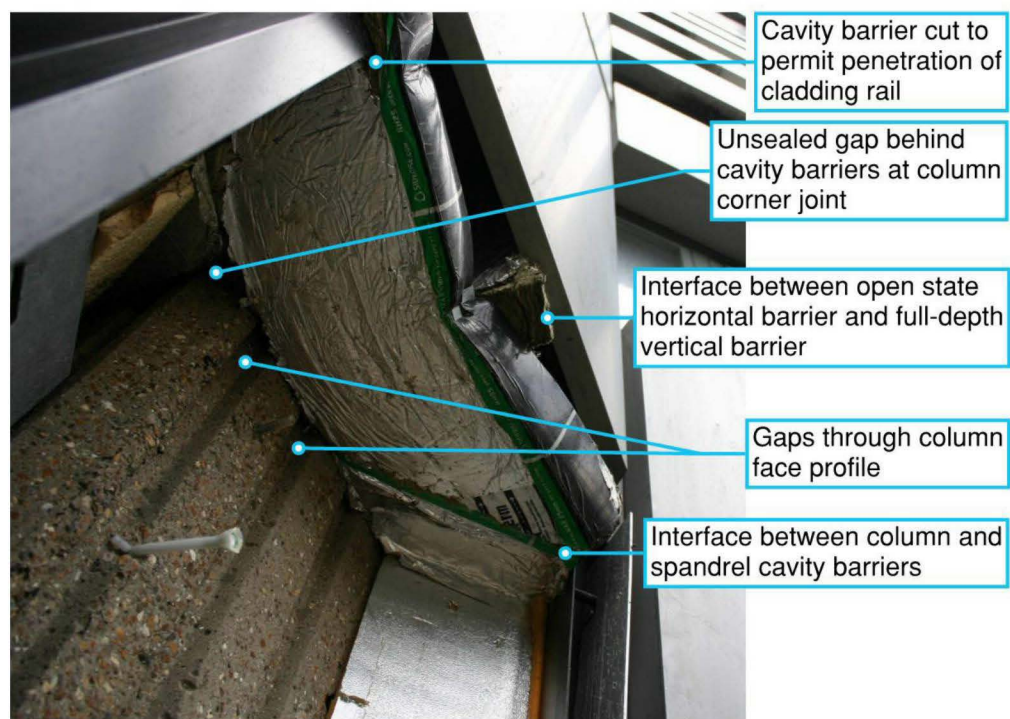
Horizontal column cavity barrier example - floor 4, external Flat 12.
